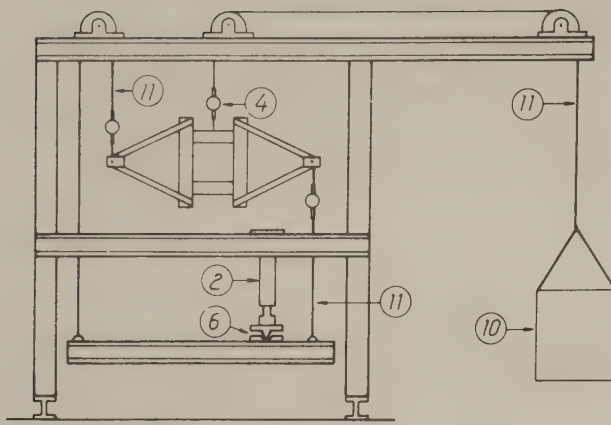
Details of loading and support arrangements for test beams G1-G4. Notations, see Fig. 4.3.2.
